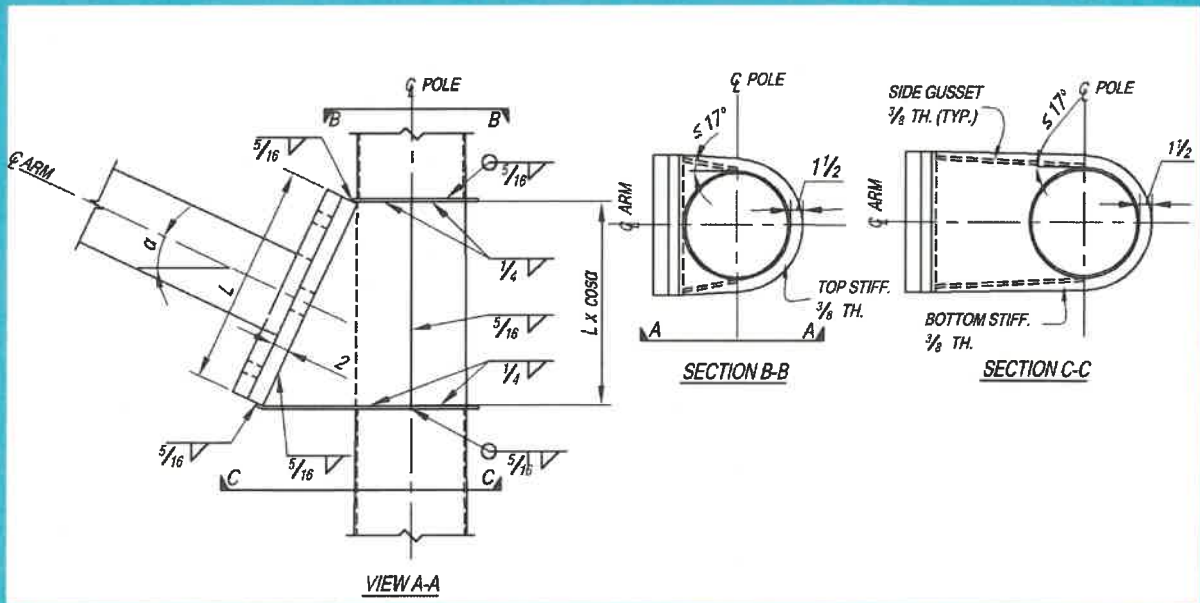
Details of Fillet-Welded Ring-Stiffened Box Connections
